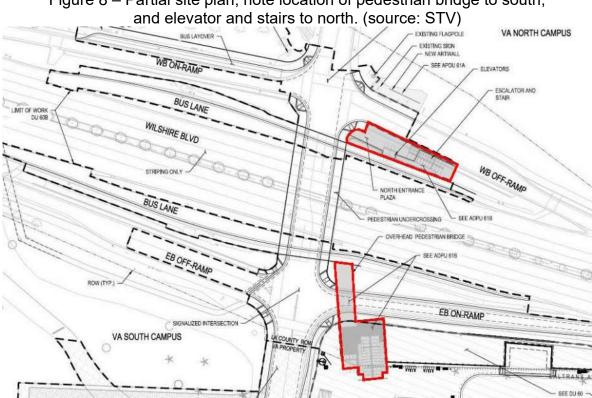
Partial site plan, note location of pedestrian bridge to south,
